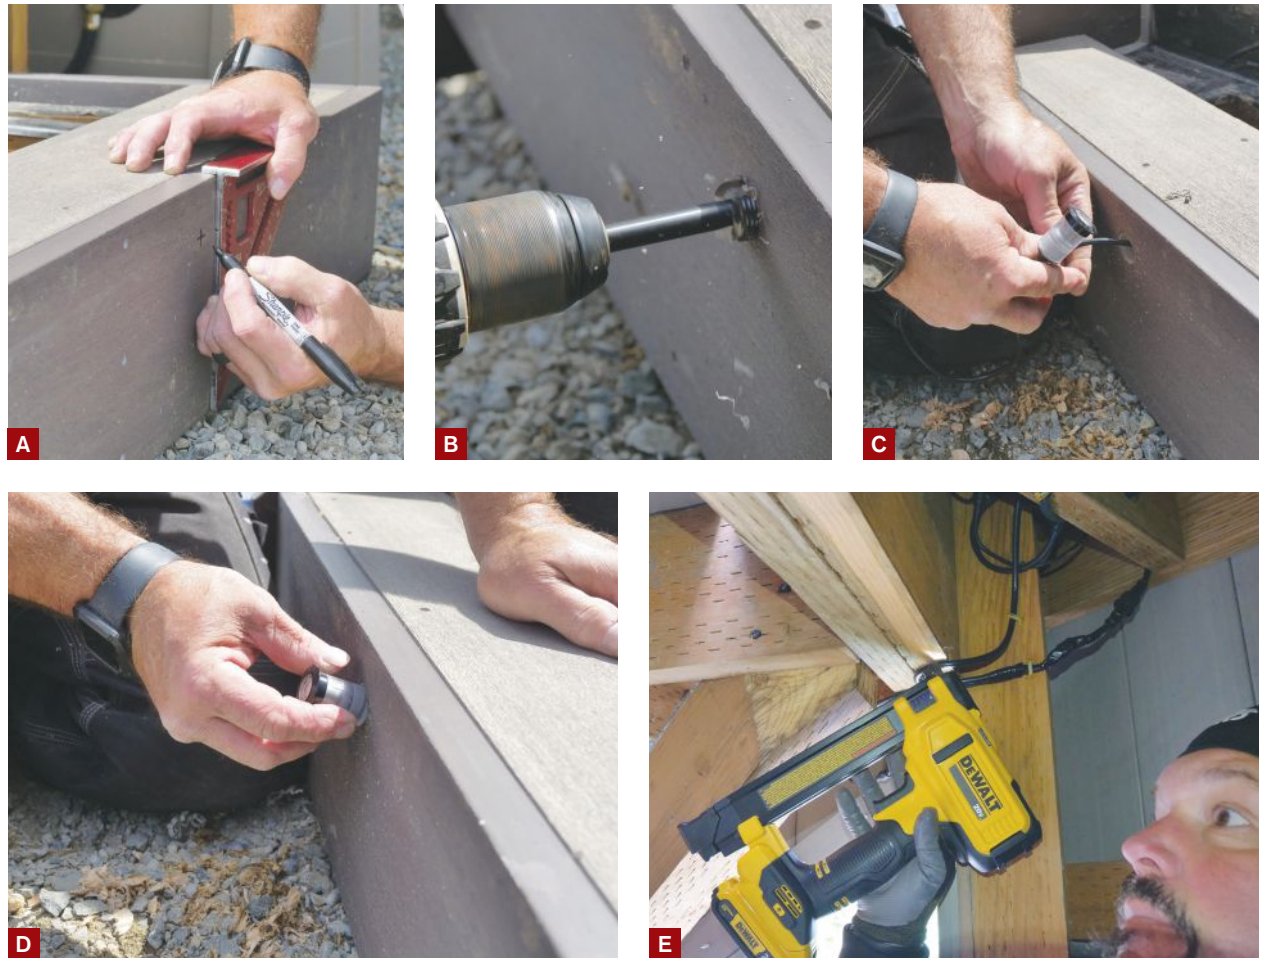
To install a puck light, the author lays out (A) and drills the proper diameter hole with a Forstner bit (B), which creates a clean hole in composite material. After connecting the fixture to supply wiring (C), he installs the fixture; friction holds it in place (D). A cordless stapler makes quick, neat work of running the wiring for the low-voltage system (E).
